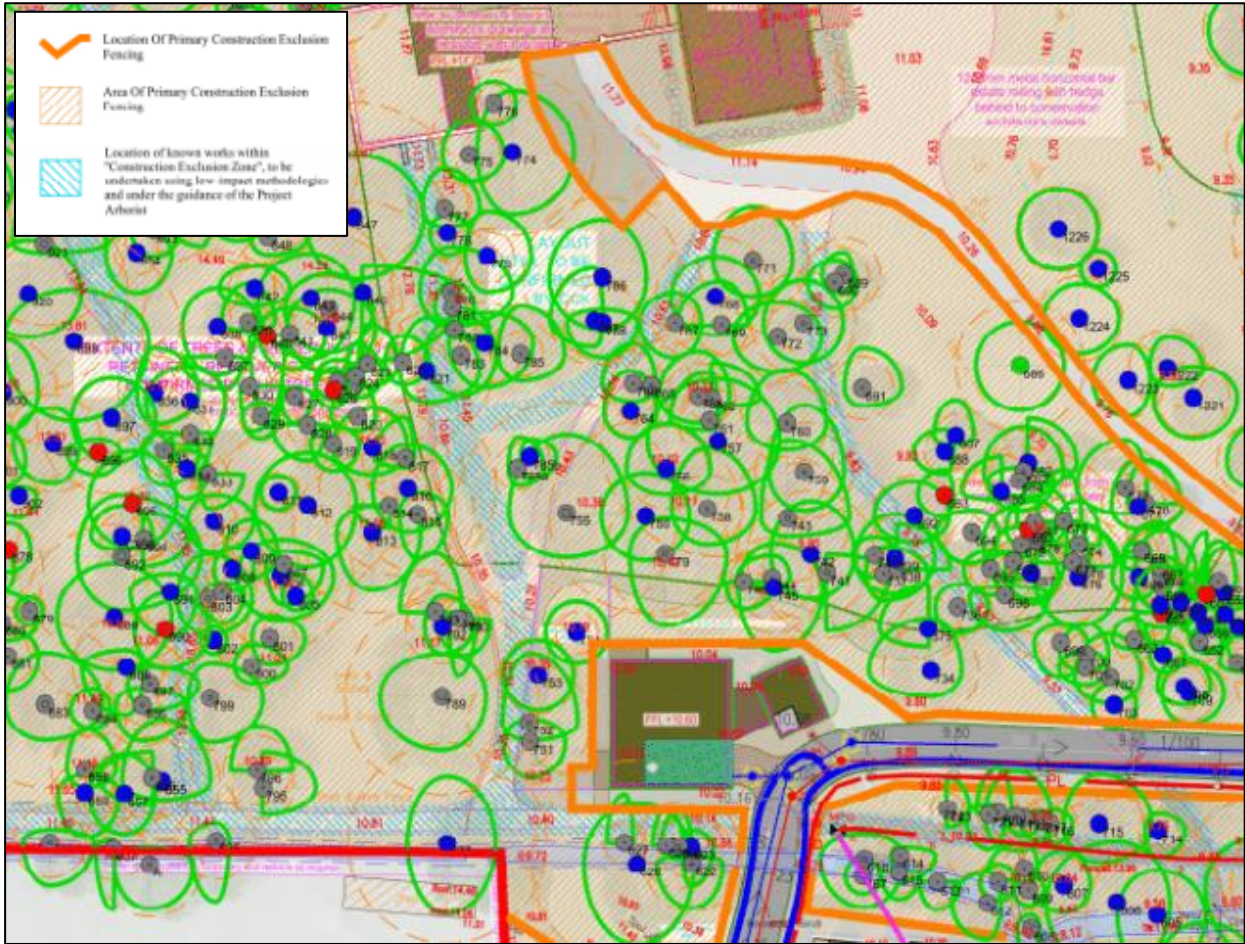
| Arborists Tree protection Plan Drawing, Sample Extract
